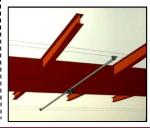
Design of a svstem for inspection of the surface under a bridge deck.
